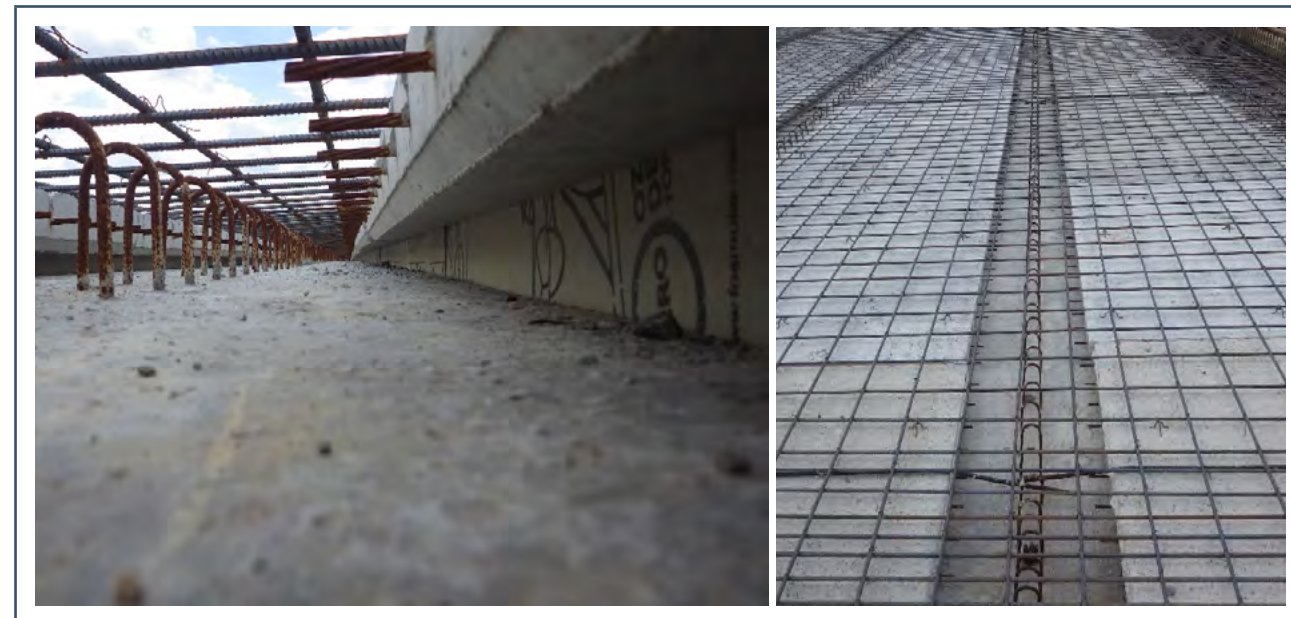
Precast panels placed on bedding strips (left), and panels shown with cast-in-place deck reinforcement (right) from Texas DOT
